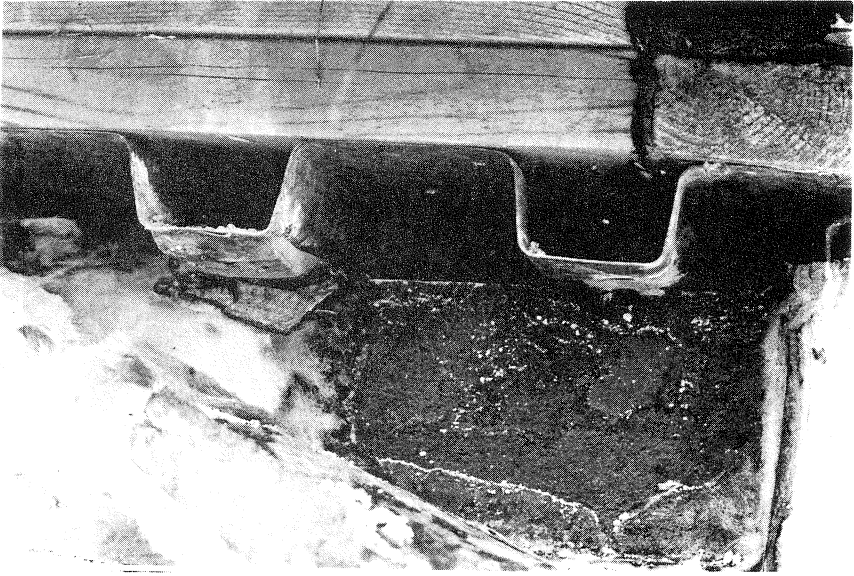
No Closures were Provided in Troughs or Fluted Deck
